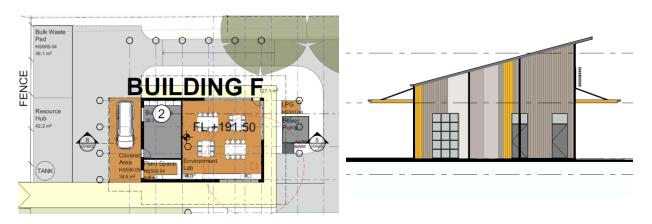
Agricultural and Environment Learning Centre: Floor Plan (left), Elevation (right) Source: SHAC
